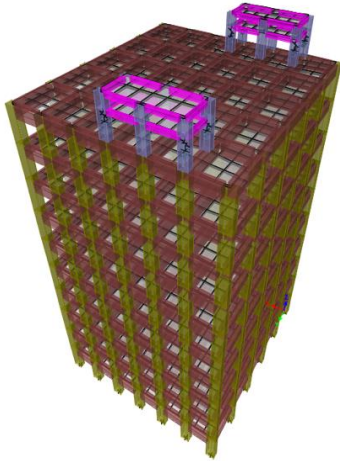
3D view of rectangle shaped building of two water tank using half volum($V_2=6759m^3$).
